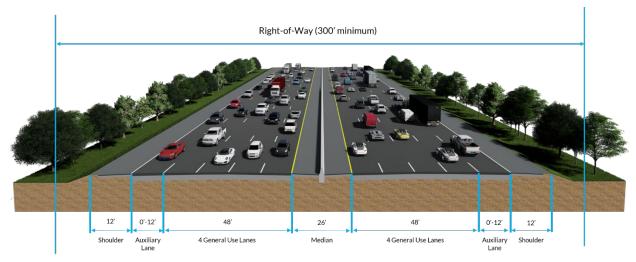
I-95 Typical Section from I-295 to J. Turner Butler Boulevard (SR 202)
